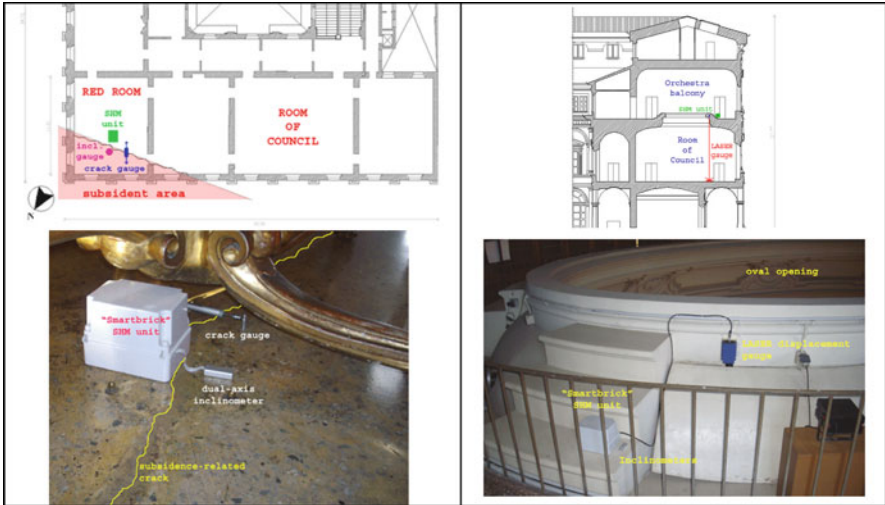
on the left: survey and equipments in the northwest building corner (Red Room); on the right: vertical section and equipments in the Room of Council
